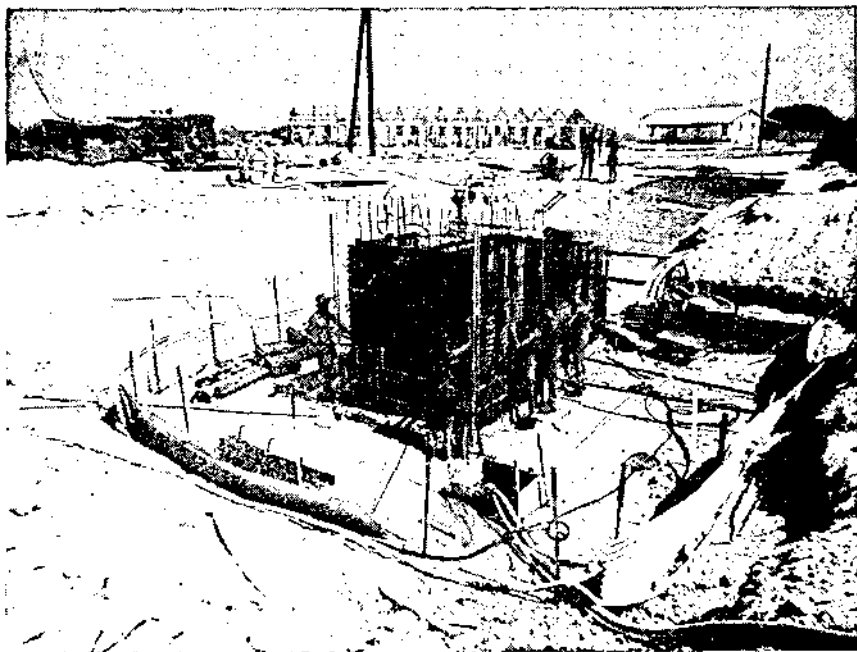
Sappers erecting the reinforcement for a sewage pumping station.
